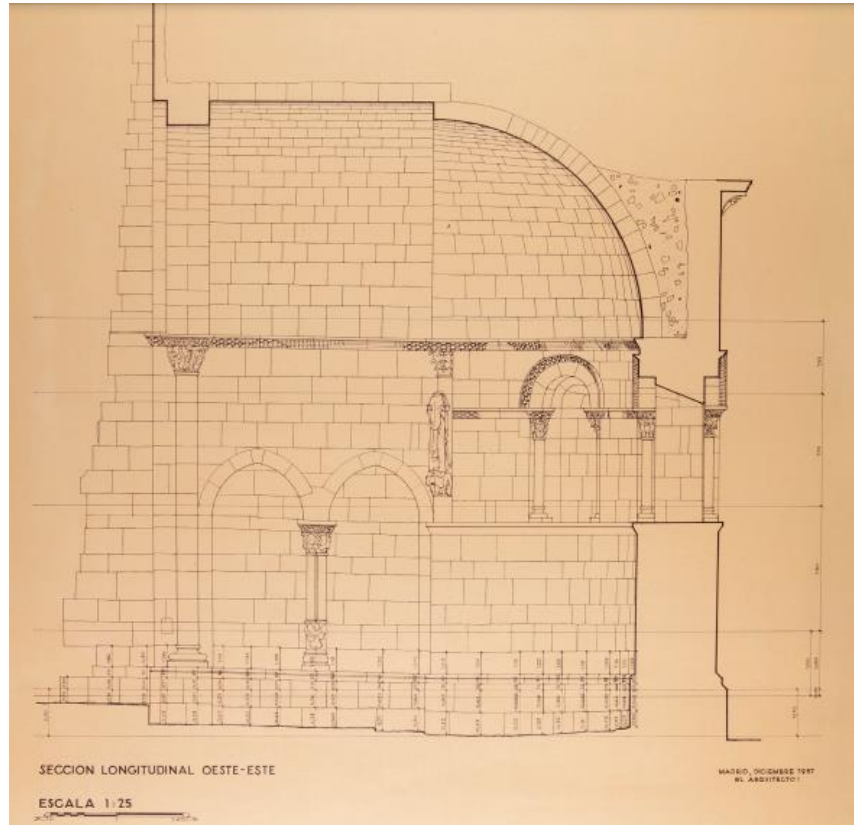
Planimetric drawings. Longitudinal Section. The MET Archive
